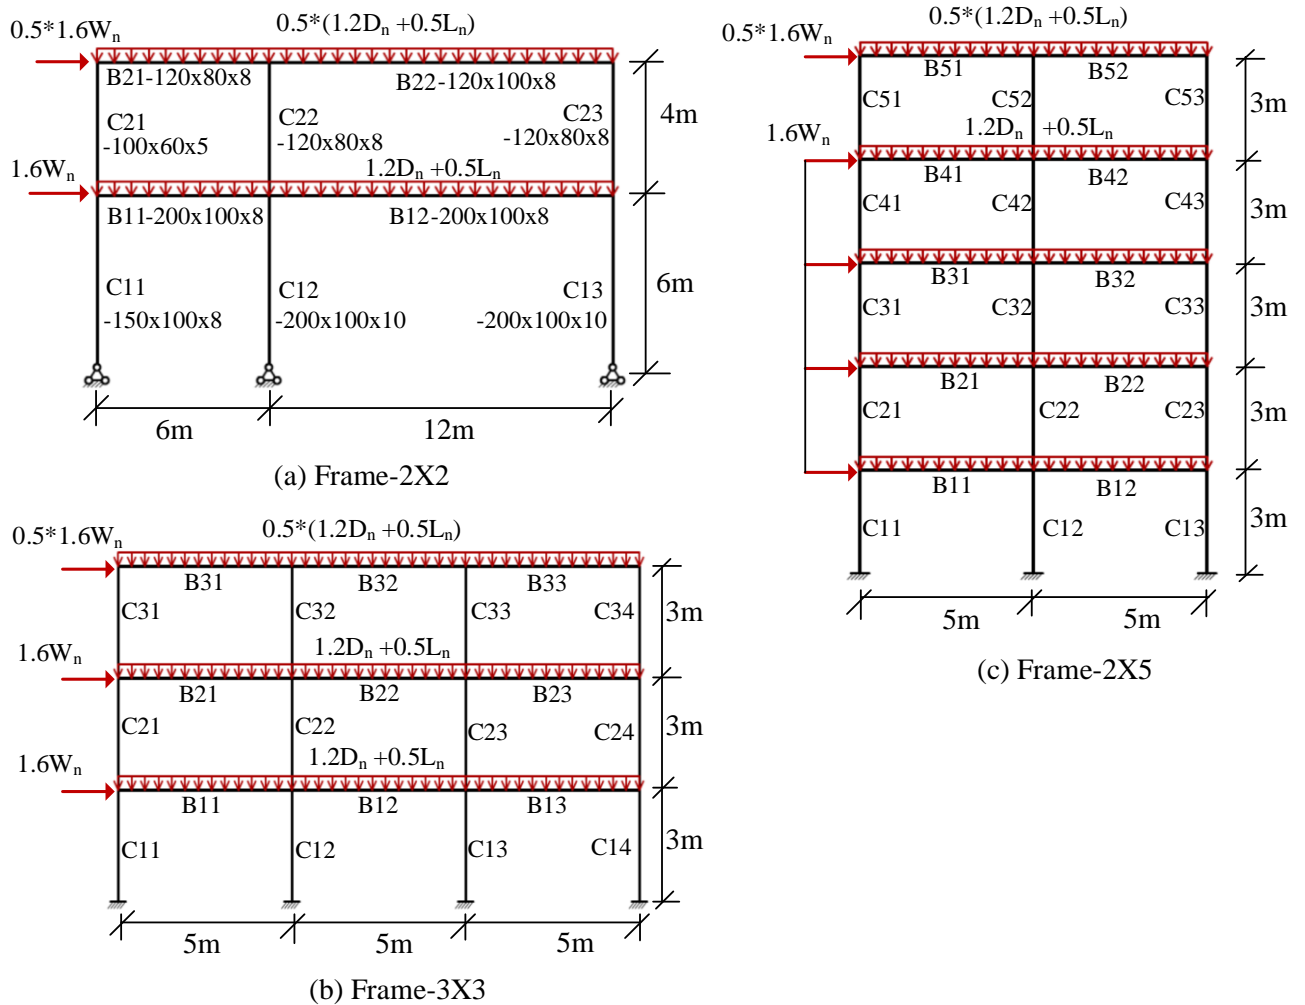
Studied stainless steel frame: (a) two bay-two storey frame, (b) three bay-three storey frame (c) two bay-five storey frame
